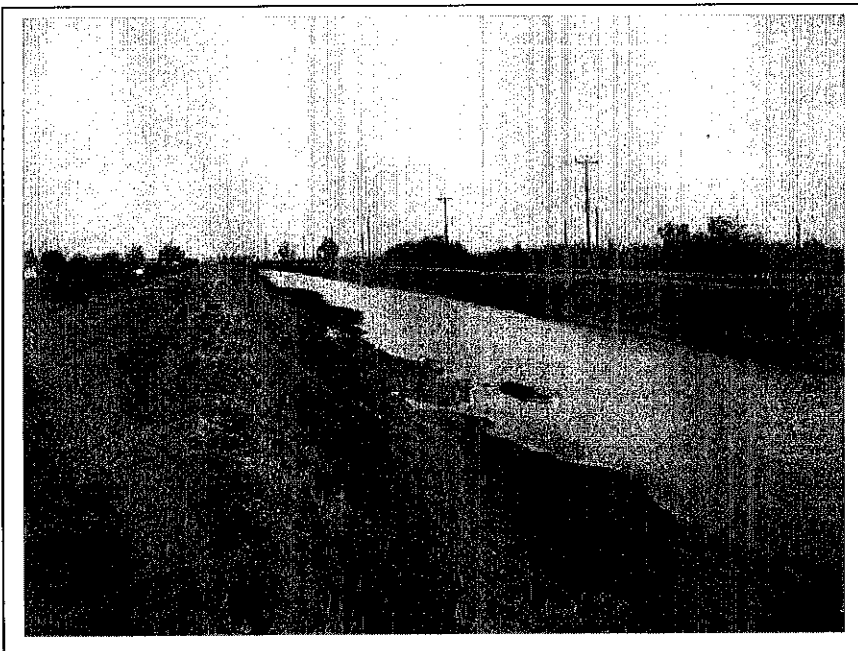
Canal Creek from Fox Road Bridge, camera facing east. 12/12/06
